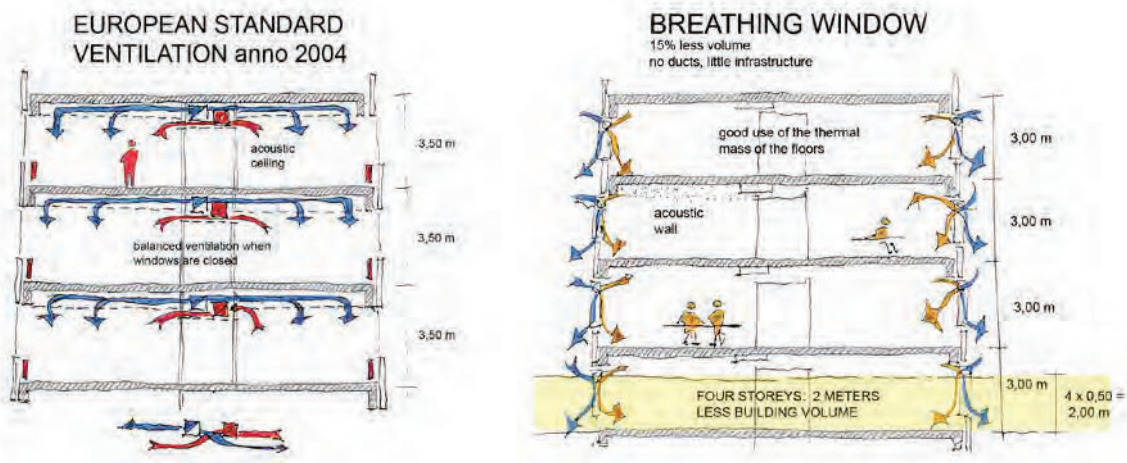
Standard ventilation system – cross-section of lowered ceilings = 0.6 m (left) and ventilation in the skin of building – 15% less volume built (right)
